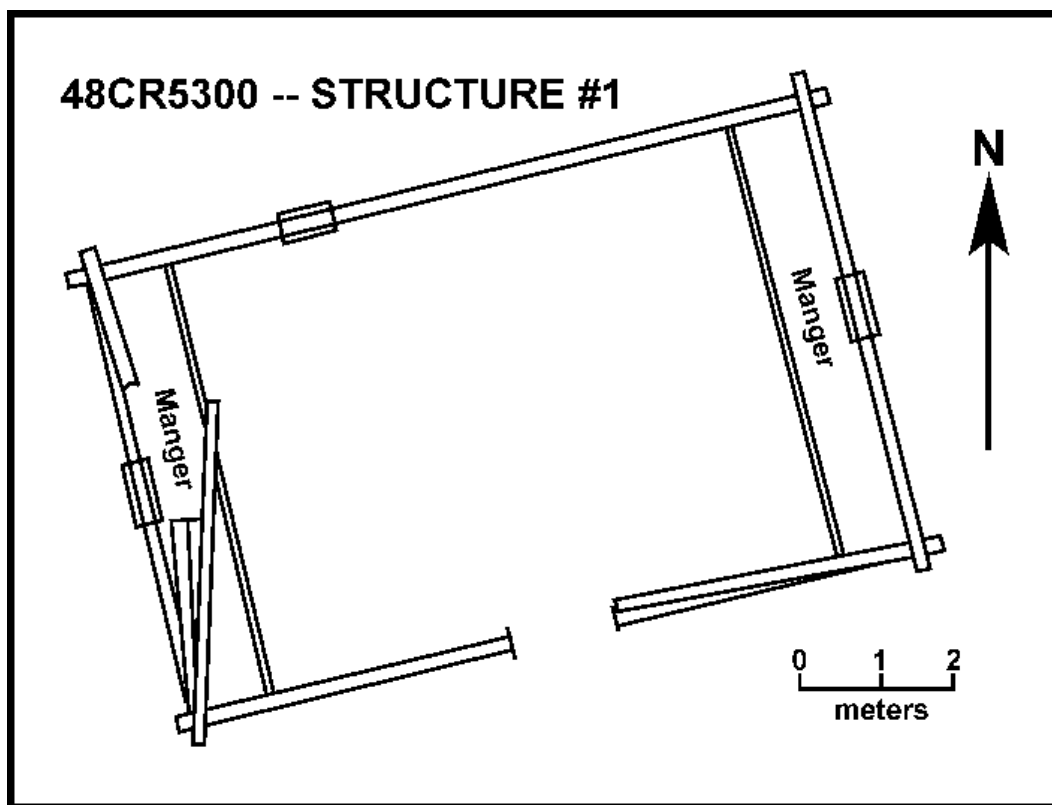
Plan view structure #1, barn; site 48CR5300/5JA792.
